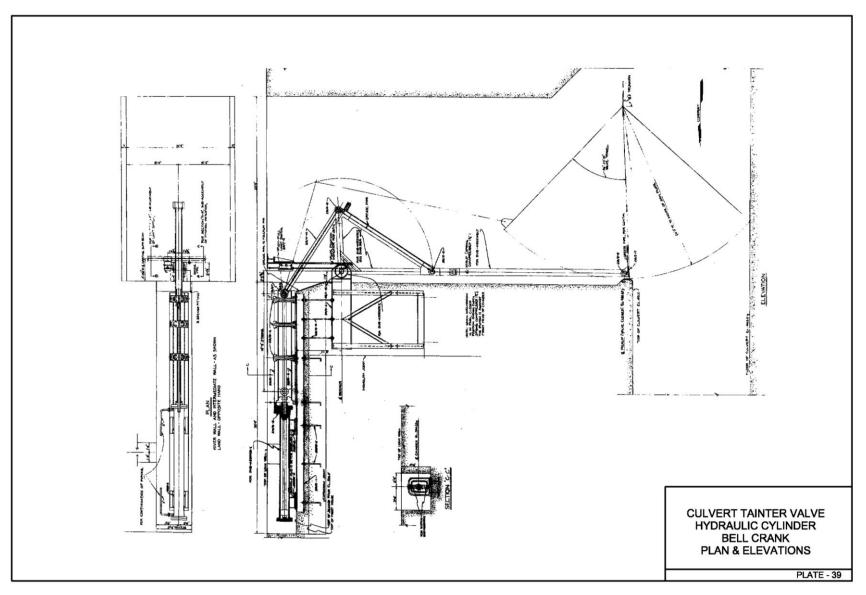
Plate 39: Culvert tainter valve hydraulic cylinder bell crank plan & elevations
